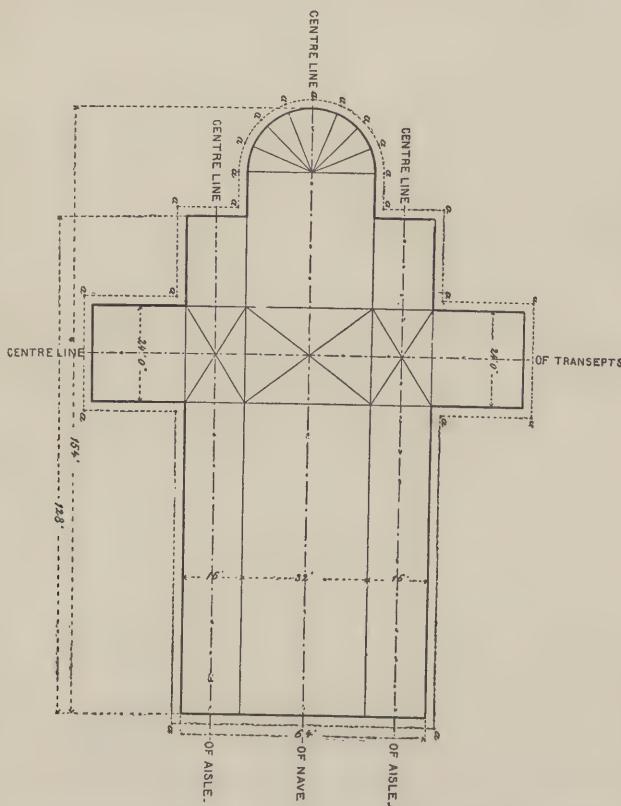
GROUND OUTLINE PLAN OF A CHURCH, SHOWING CENTRE LINES.
